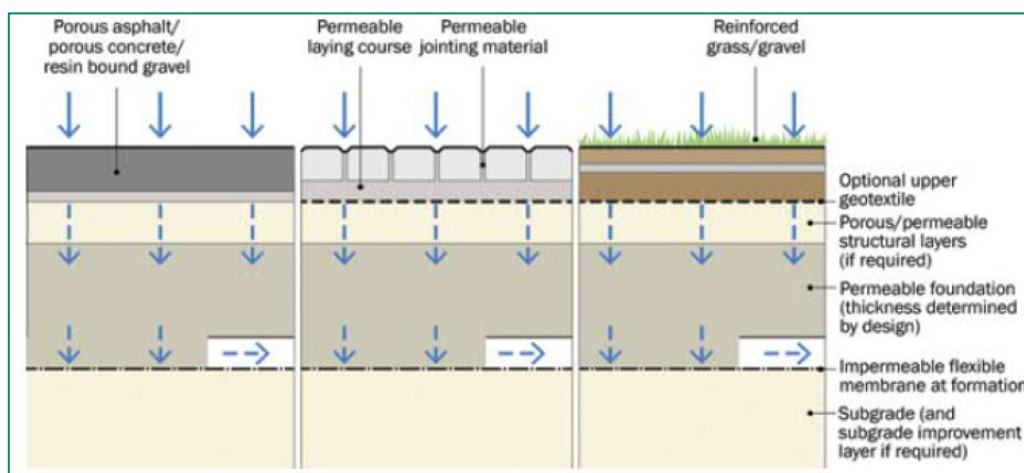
Permeable Pavement Detail - No Infiltration (Source: CIRIA SuDS Manual C753)
